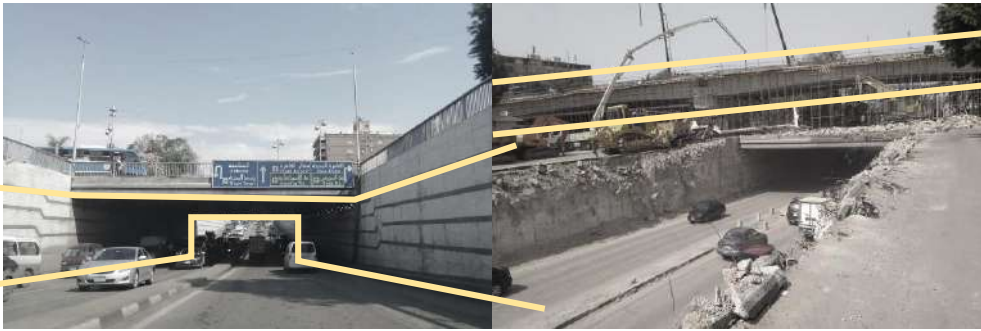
AL-Orouba tunnel before and after demolition and constructing the bridge above it (eg24.news, 2020)
